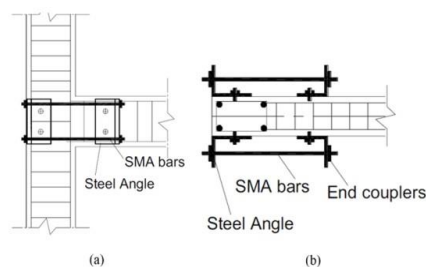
Retrofitting technique (a) elevation view (b) plan view [14]
